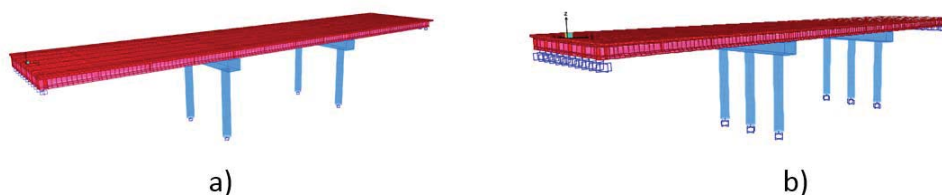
Model of the bridges with Pier Type I and Pier Type II.
